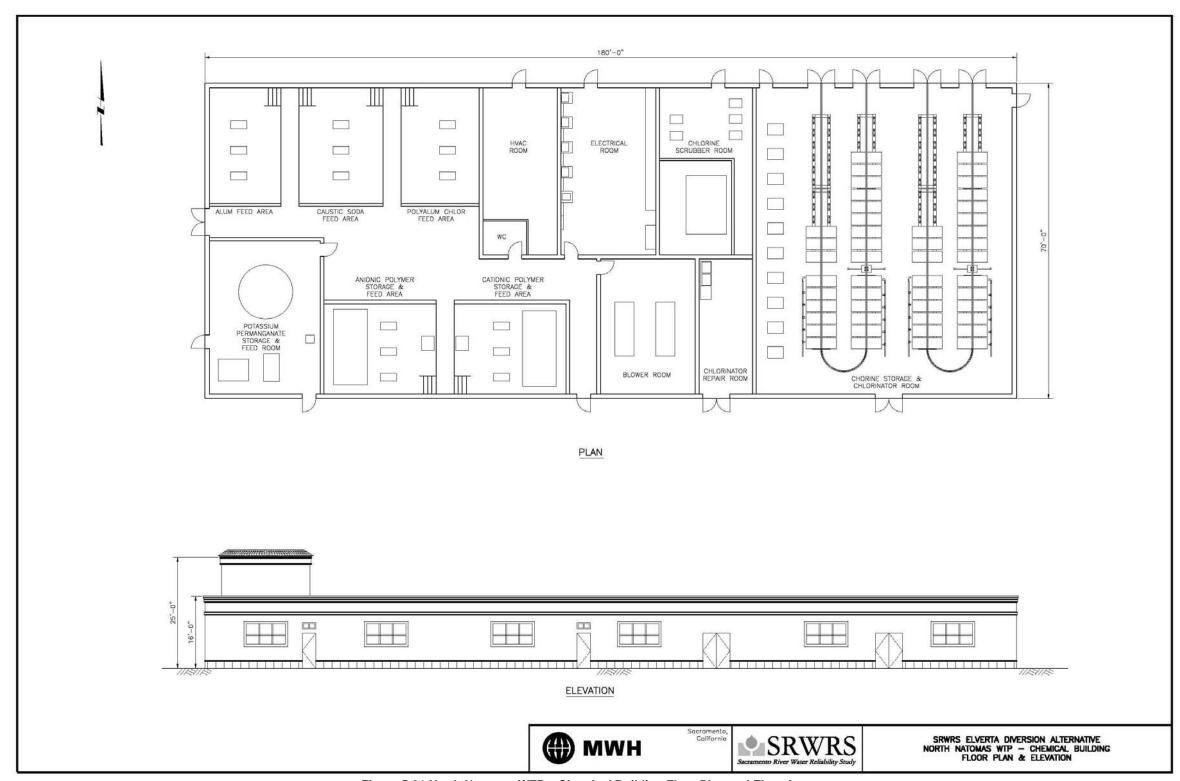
North Natomas WTP – Chemical Building Floor Plan and Elevation
